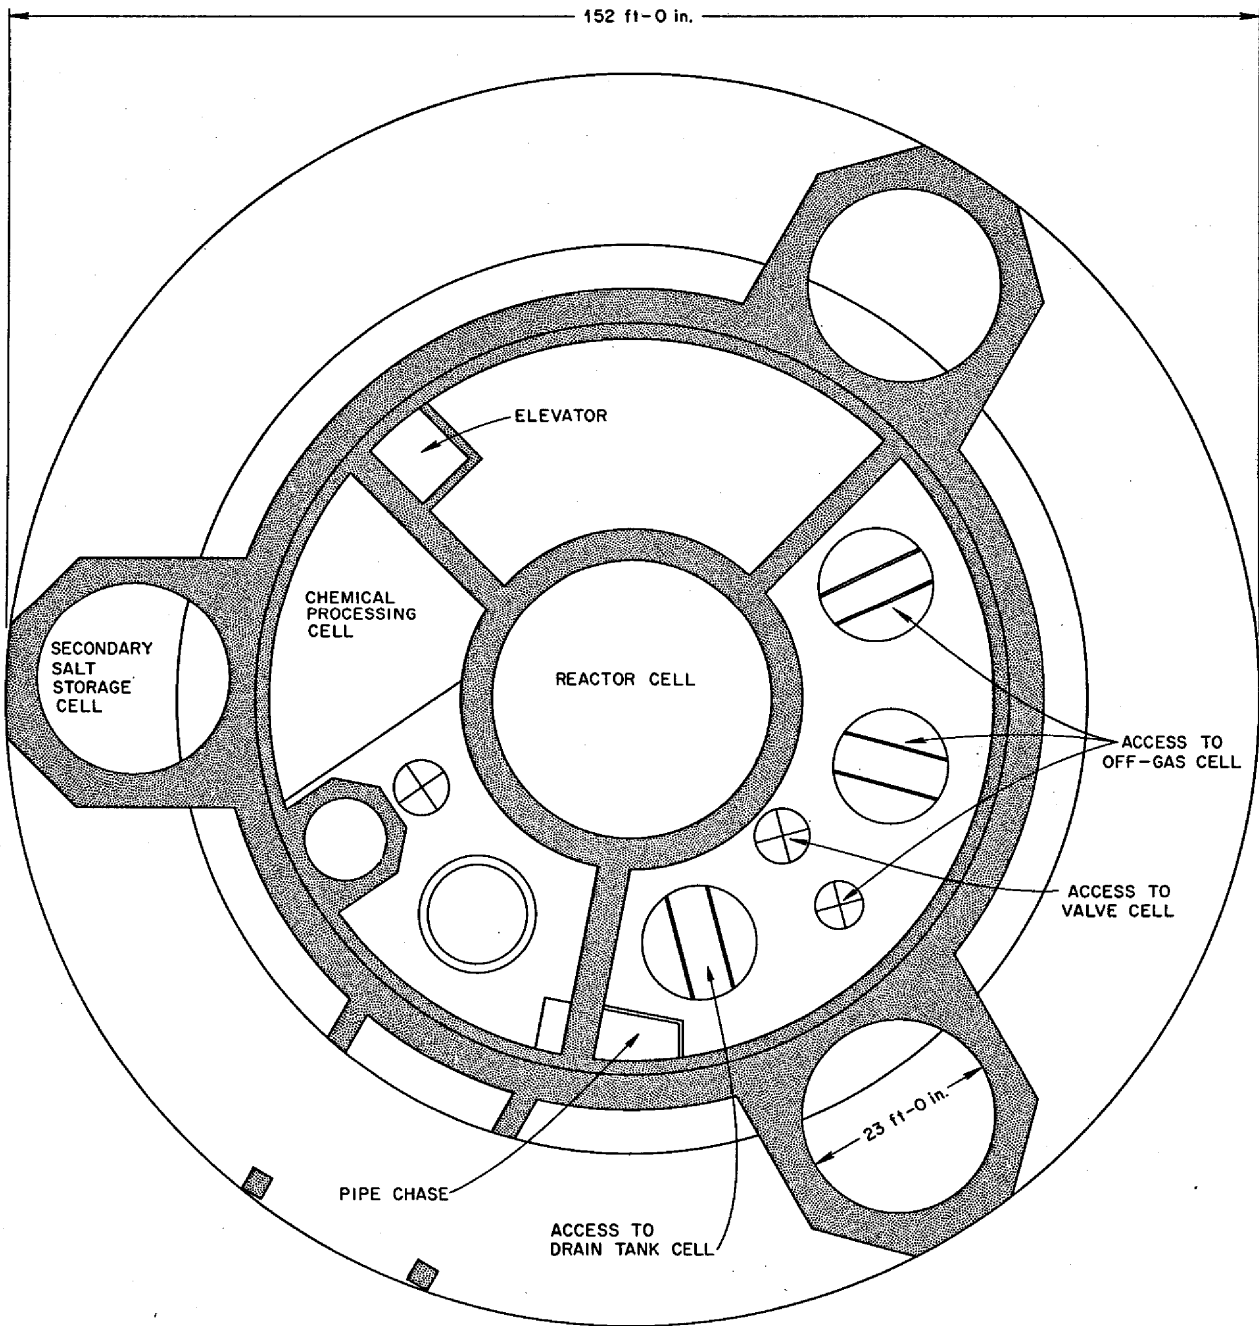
Plan View, Second Floor of Confinement Building, Section BB.
